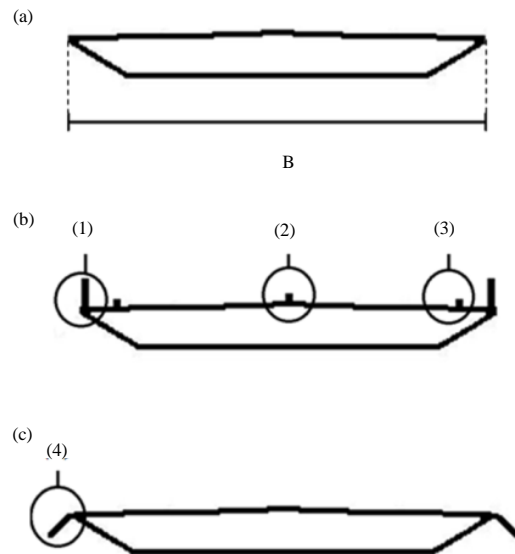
Forth road bridge deck; a) Configuration 1- construction state configuration: B deck width; b) Configuration 2-configuration with cross-section details: 1 Vertical barriers; 2 Dividing strip; 3 Railings; c) Configuration 3-configuration modified through a couple of sloping barriers and 4 Sloping barriers
